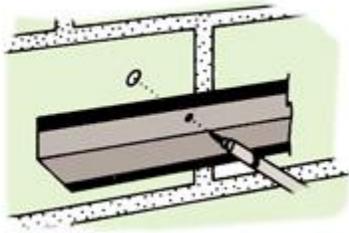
Fasten the wall angles securely to the wall at all points.
